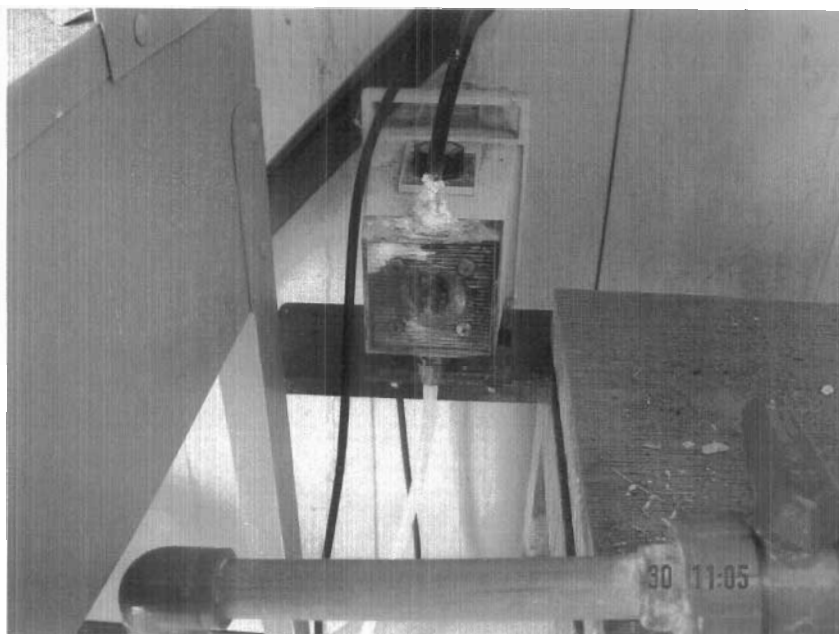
Corroded chlorine pump in Water Treatment Facility.
